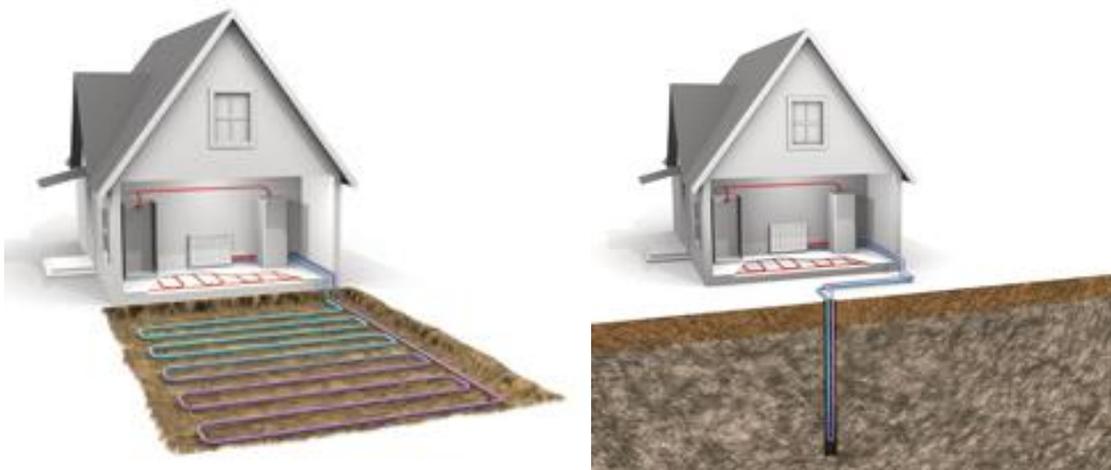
Horizontal (left) and vertical (right) GSHP piping configurations (Thermia, n.d.)
